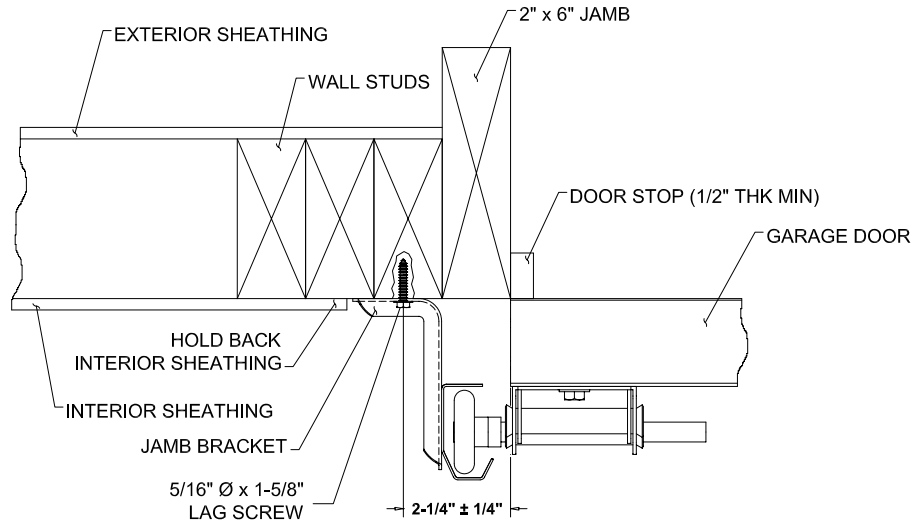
Attachment of Garage Door Brackets Directly to Wood Wall Framing (Option 1)
